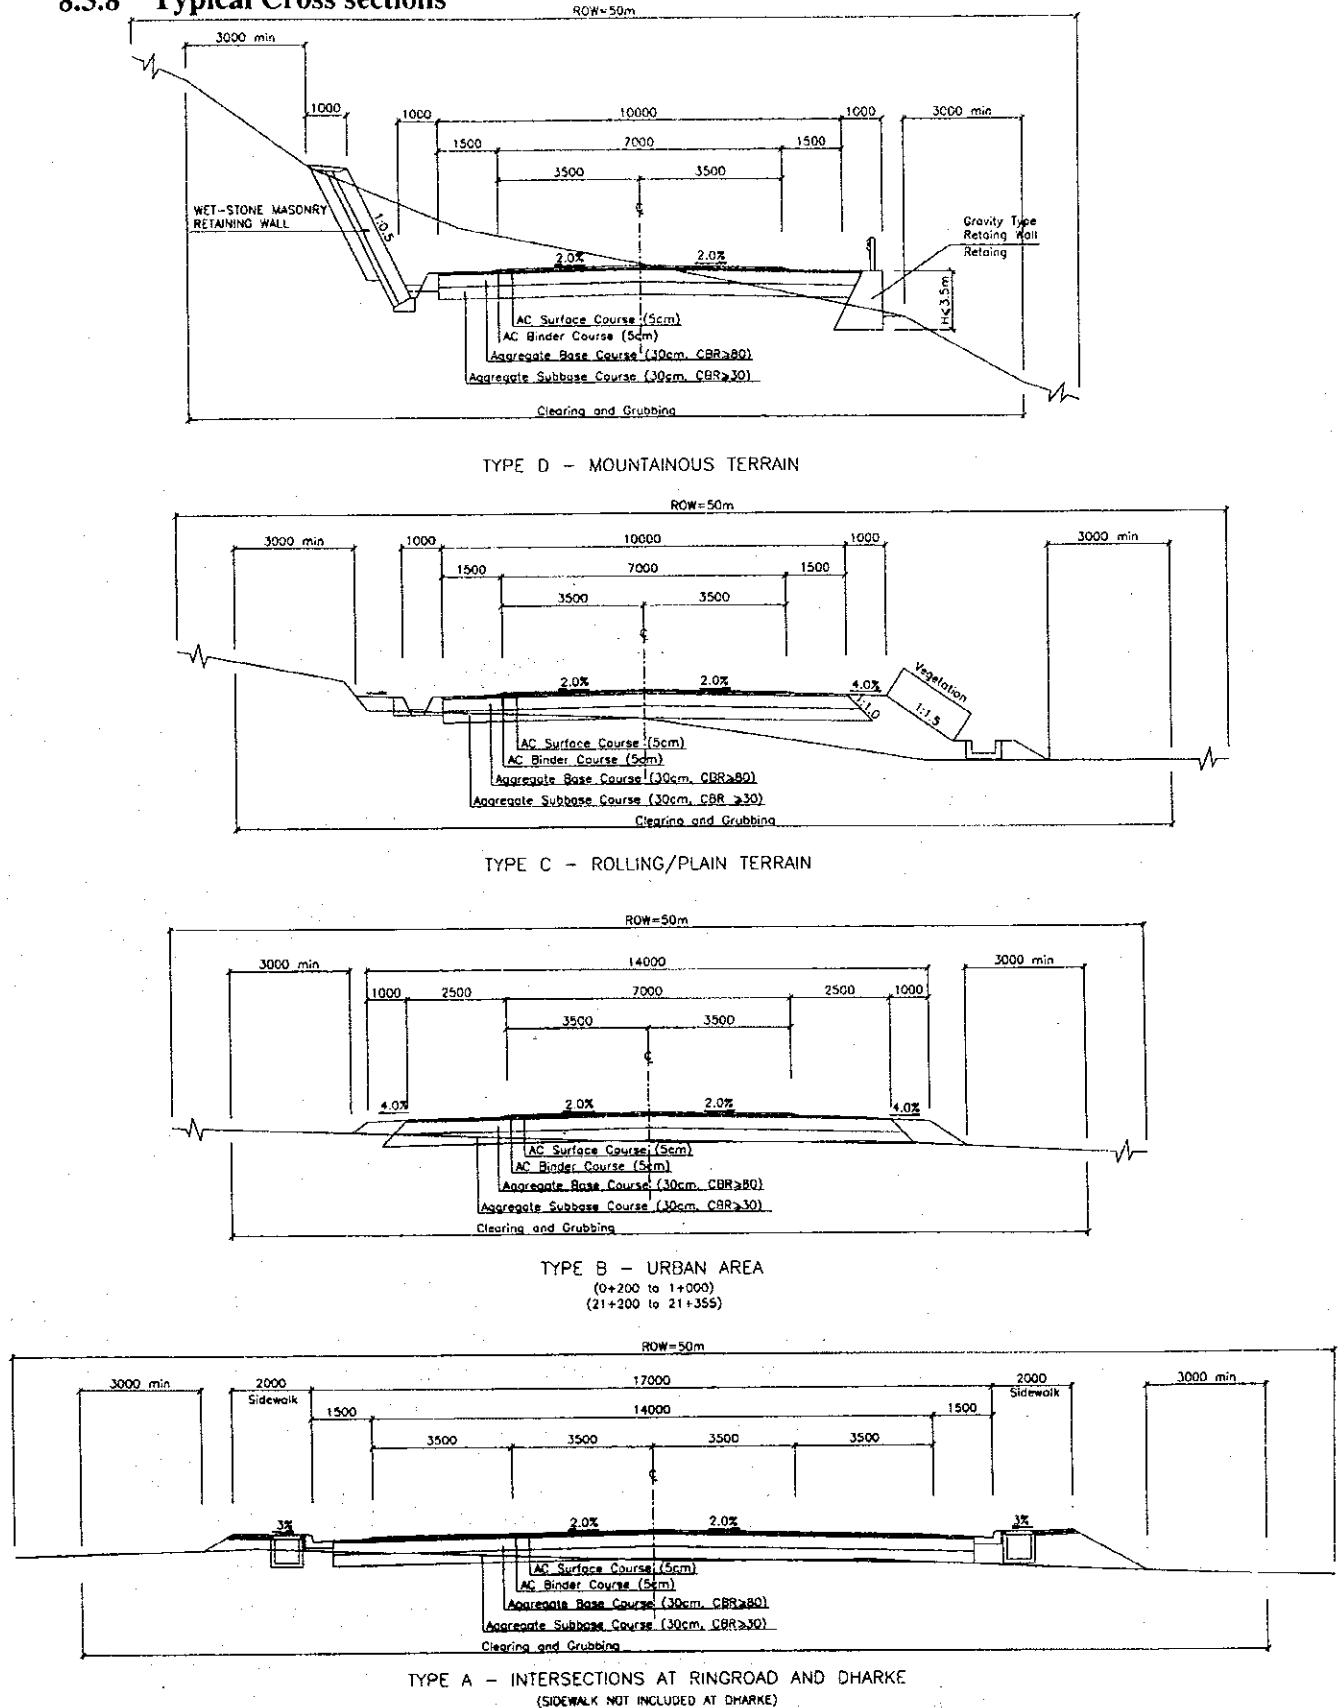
(1/2) Typical Cross Sections on Roadway
